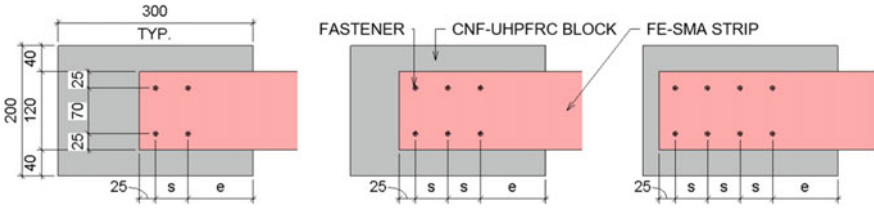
Various anchorage configurations investigated in the anchorage tests. s—fastener spacing, e—edge distance
